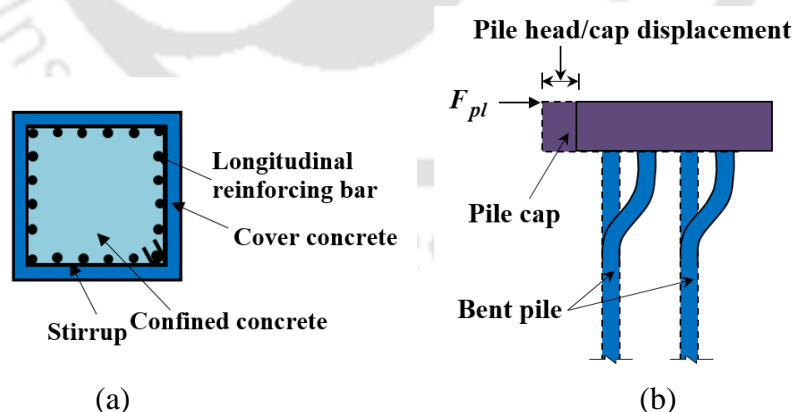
(a) Pile cross section and (b) seismic deformation pattern of bent-pile foundation.
